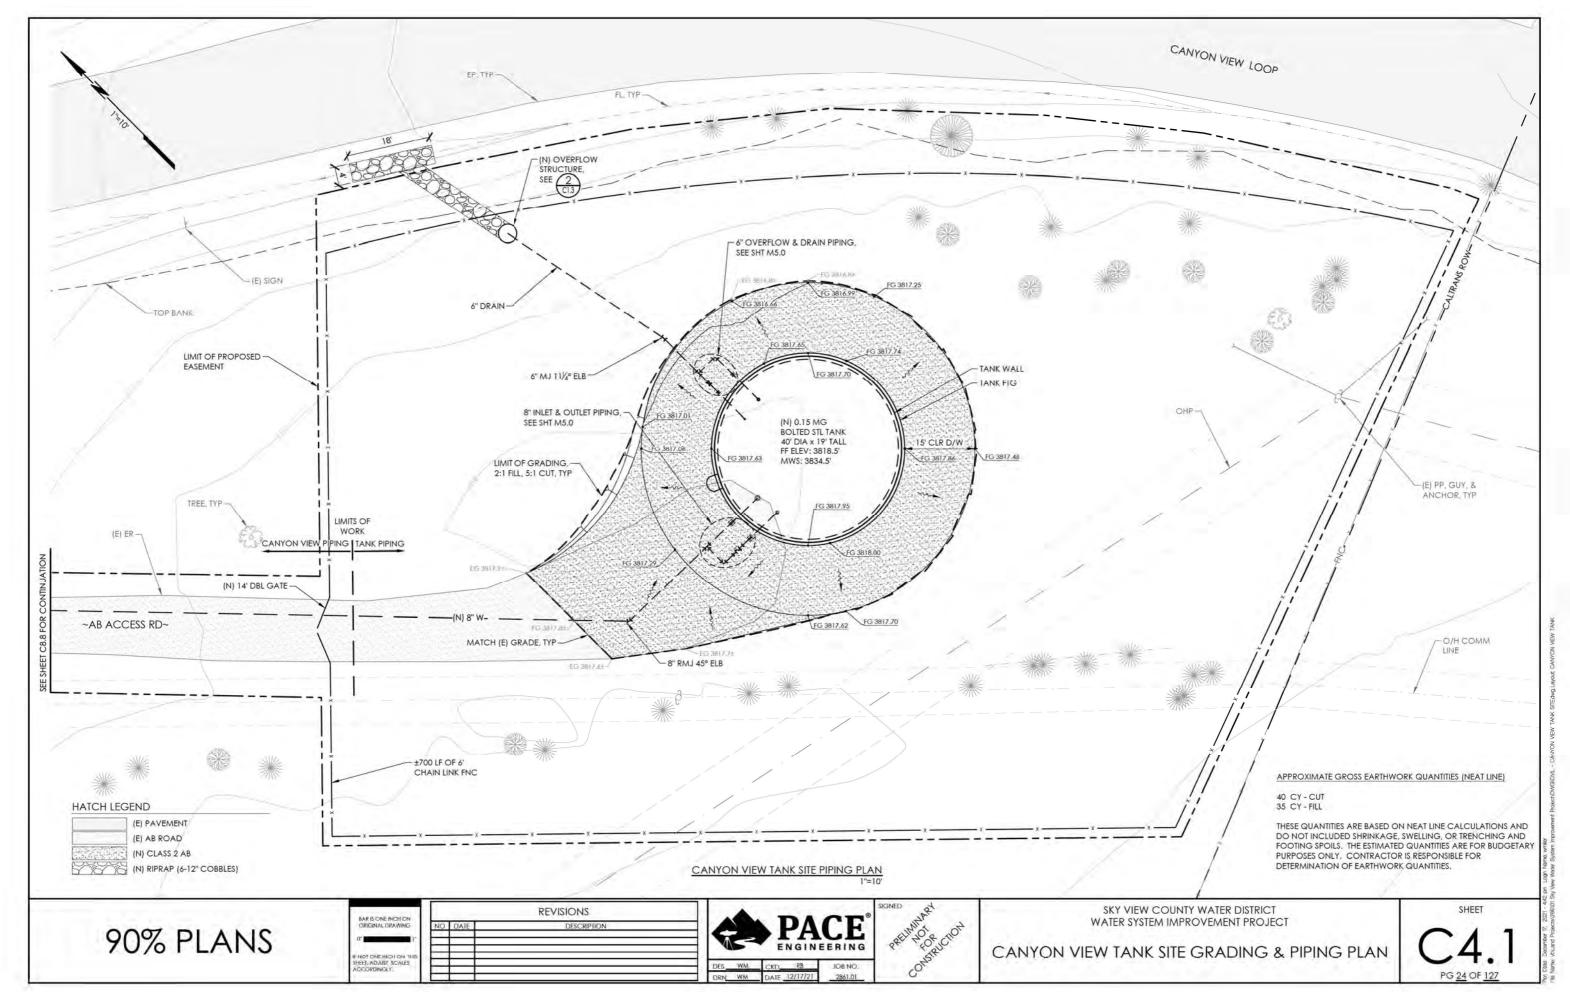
Canyon View Loop Tank Site - Preliminary Grading Plan
